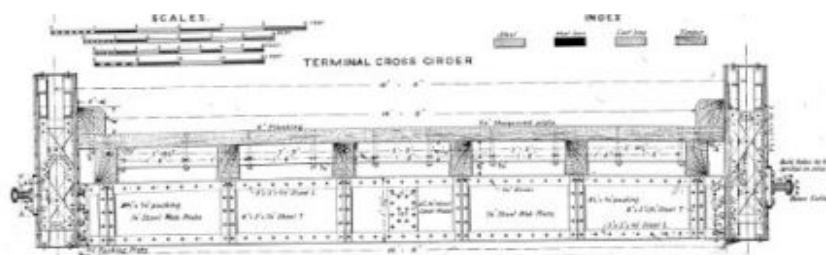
Swan Hill Bridge lift span terminal member cross sections
